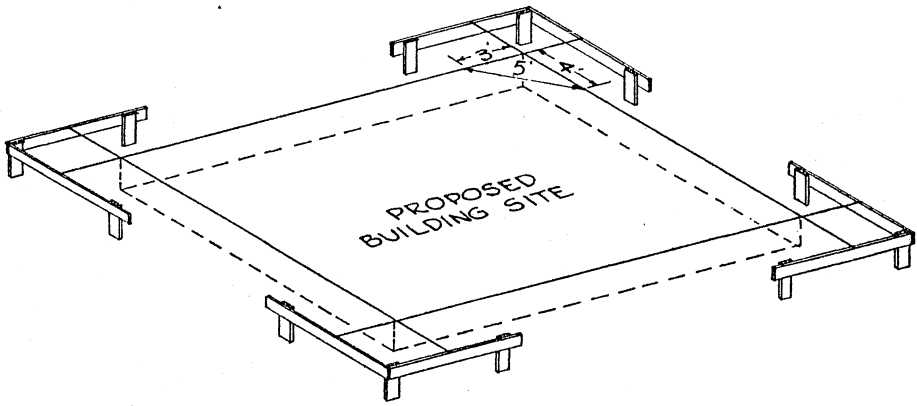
Lines outlining the building are strung between batter boards located about 3 feet beyond the proposed corners of the building. Corners are squared as shown in the diagram above.
